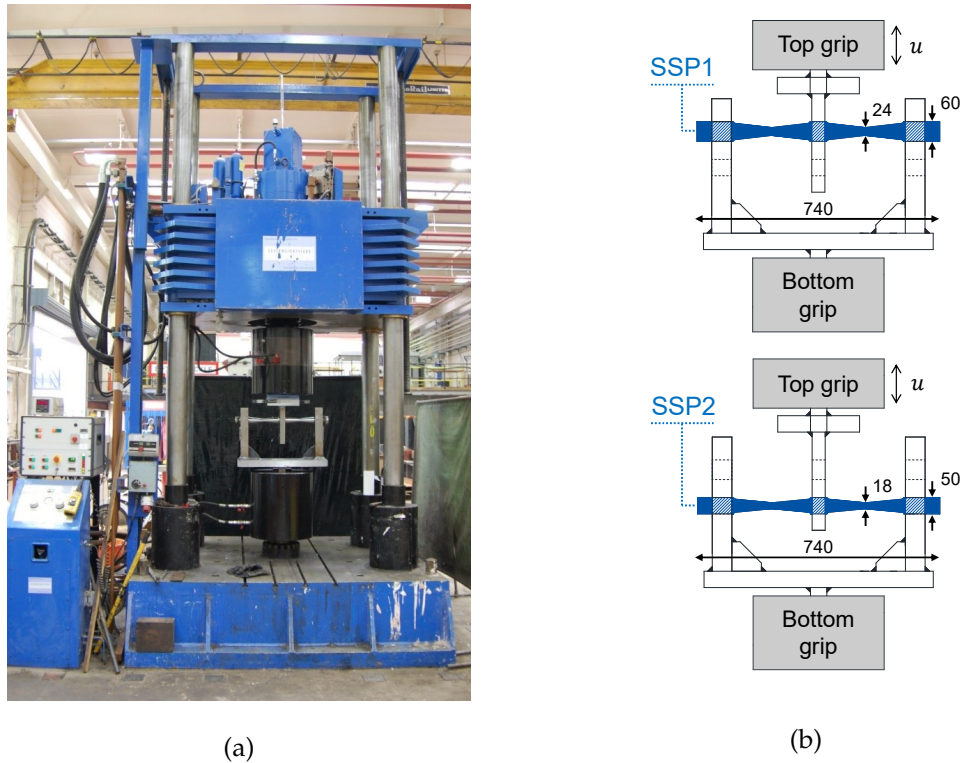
SSP testing apparatus: (a) Losenhausen UPS2000 testing machine; and (b) testing configuration for SSP1 and SSP2 (all the dimensions are in mm)
